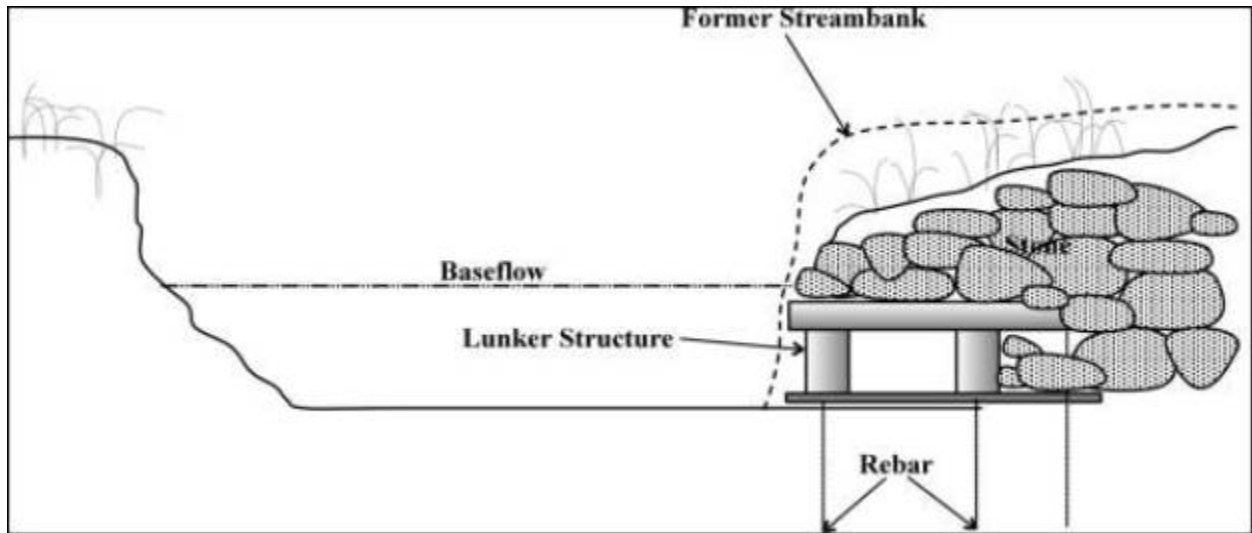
Cross-sectional view of a LUNKER structure
